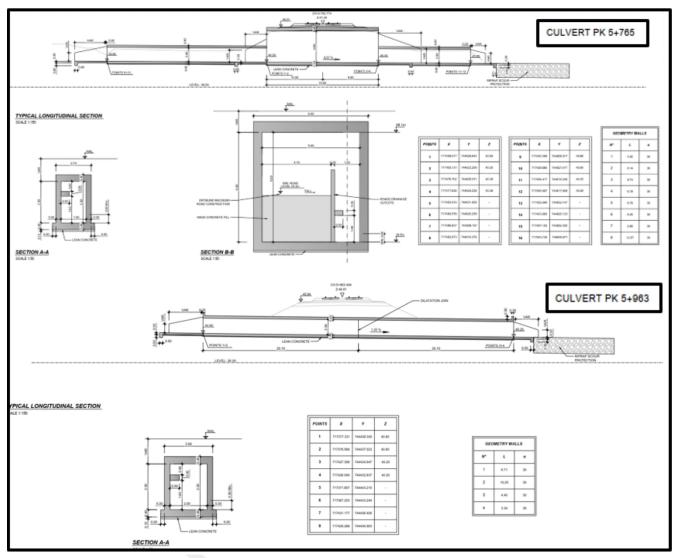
Typical longitudinal section of the proposed culvert crossings at Ch. 05 + 765 and Ch. 05 + 963 on Sluice River and tributary.
